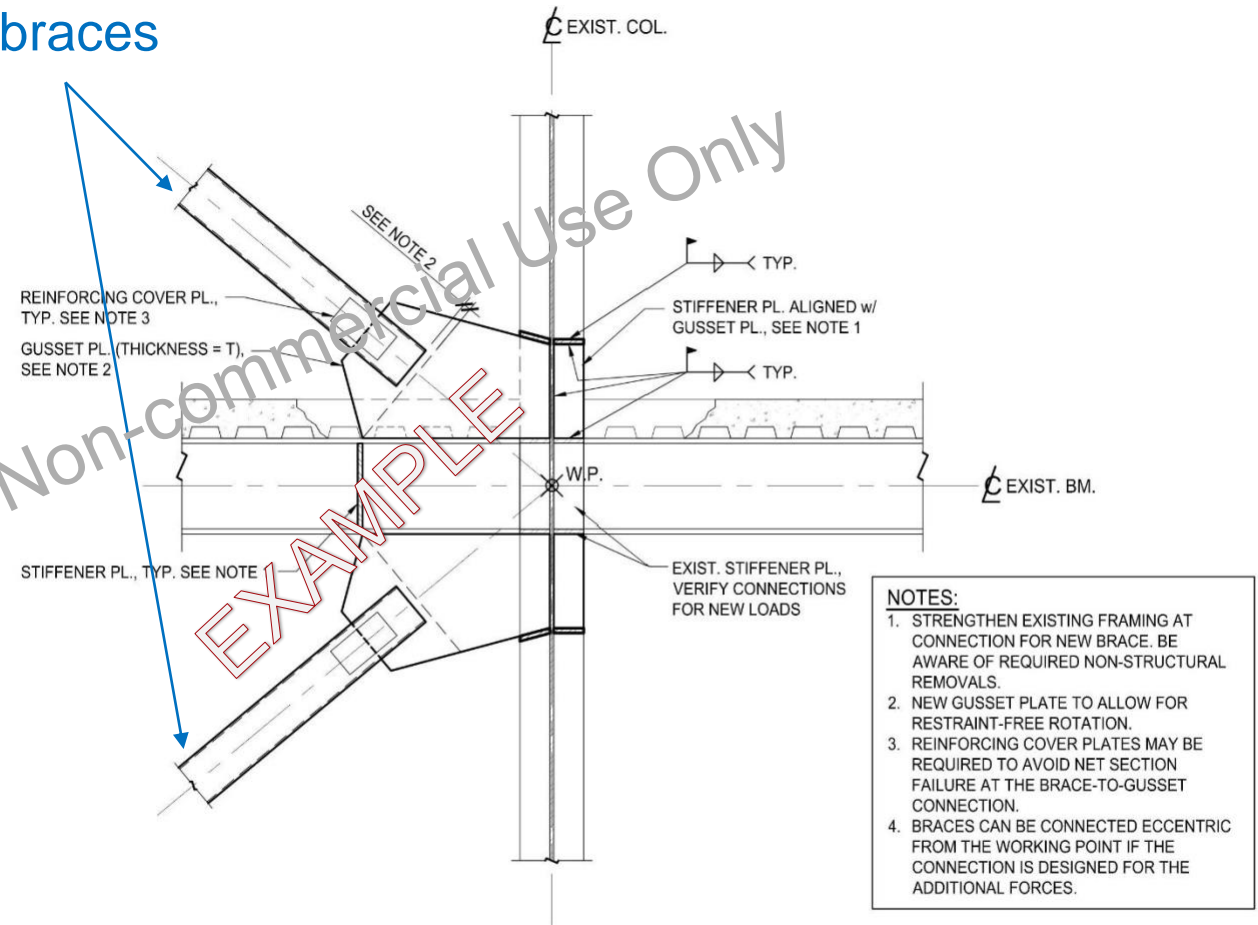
Connection of new steel brace to existing beam-column junction in moderately ductile CBF
